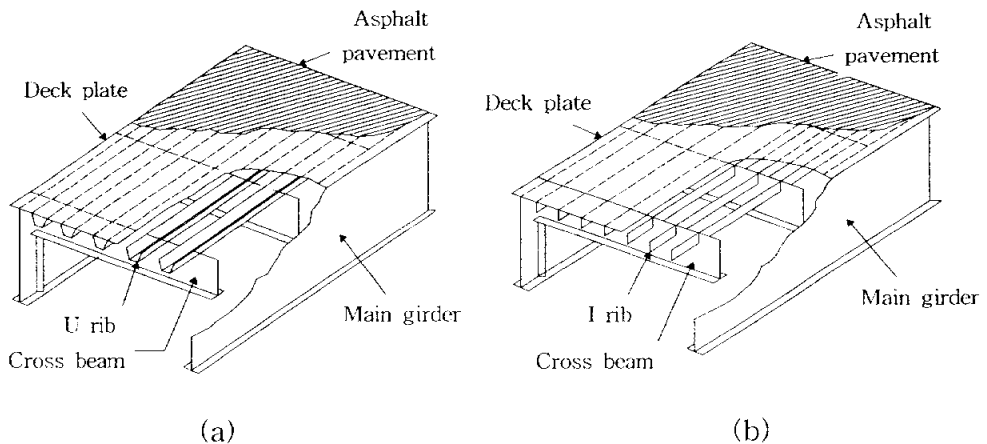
Longitudinal Stiffeners of Steel Deck Bridge :
